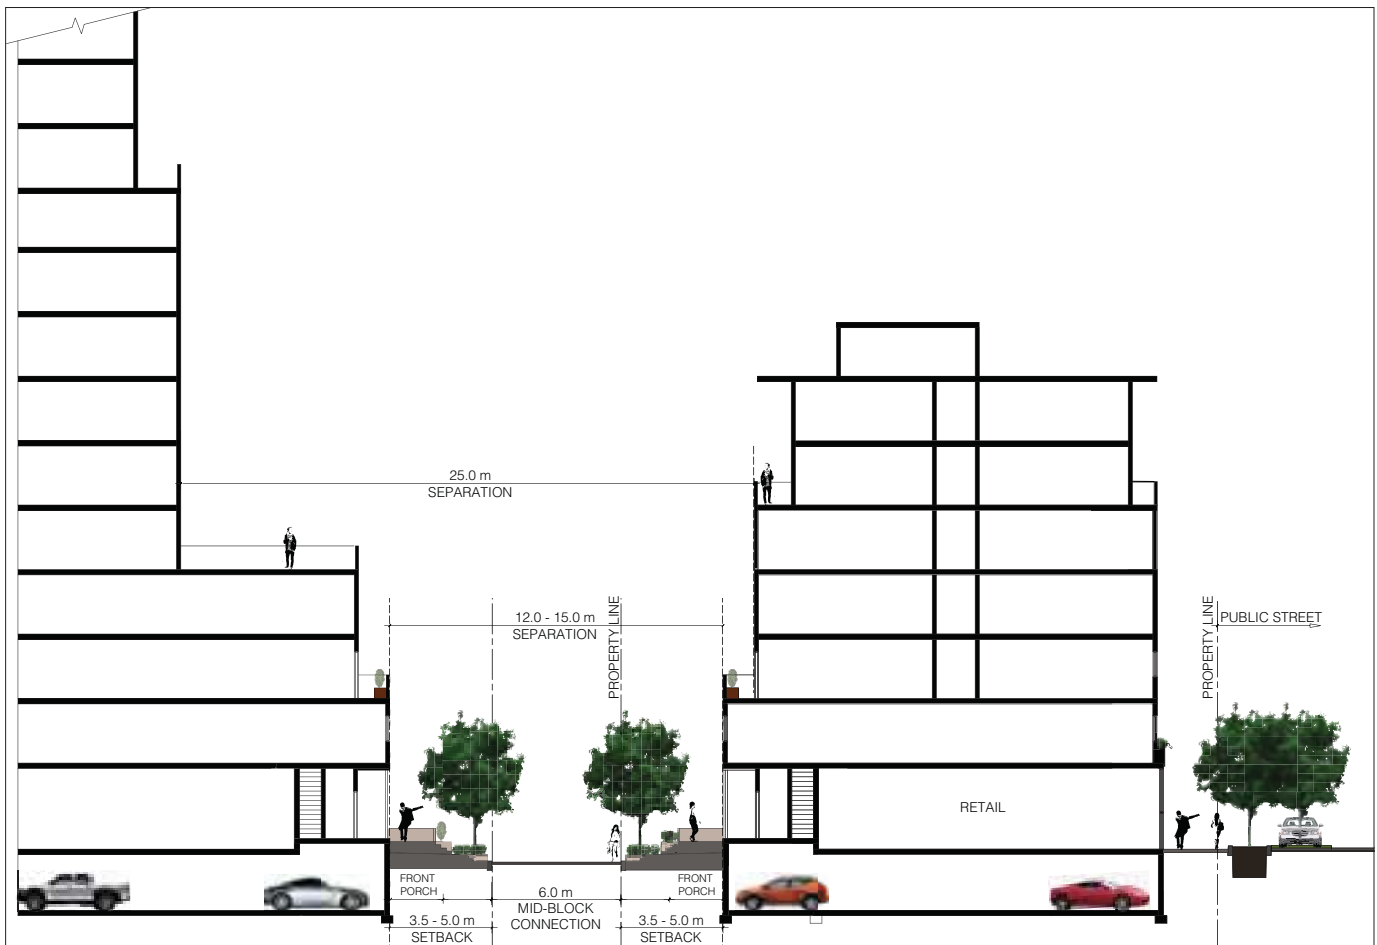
Mid-block connections between buildings should have a minimum width of 12.0 metres between building bases, 25.0 metres between buildings and a 6.0 metre pedestrian pathway.
